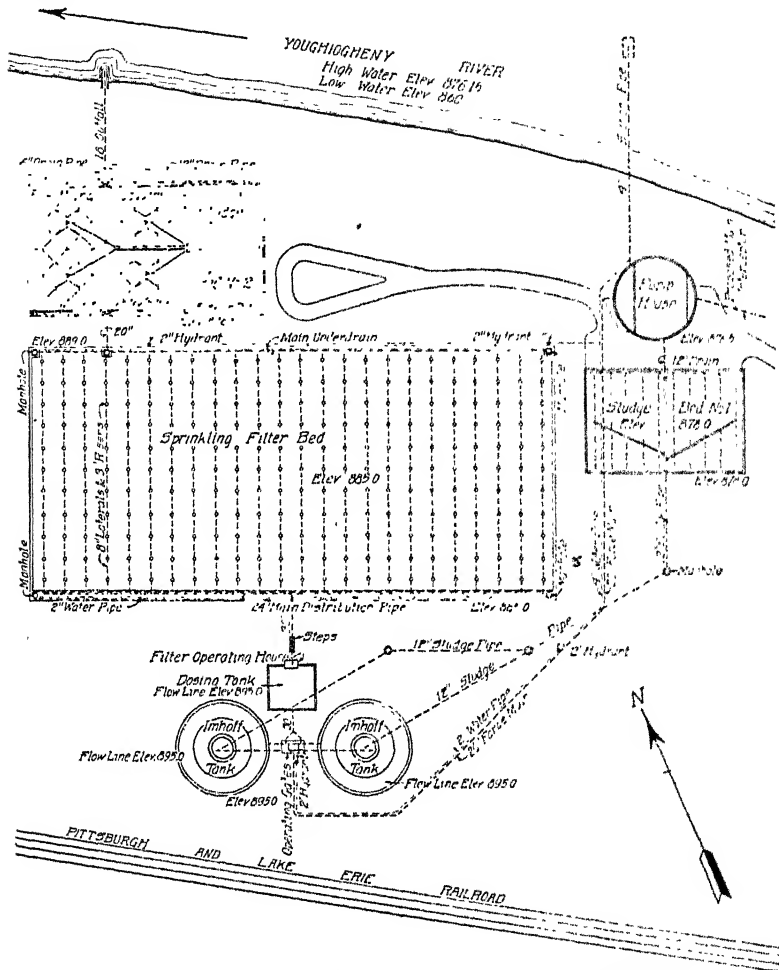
Plan of Sewage Disposal Plant at Connellsville, Pennsylvania
